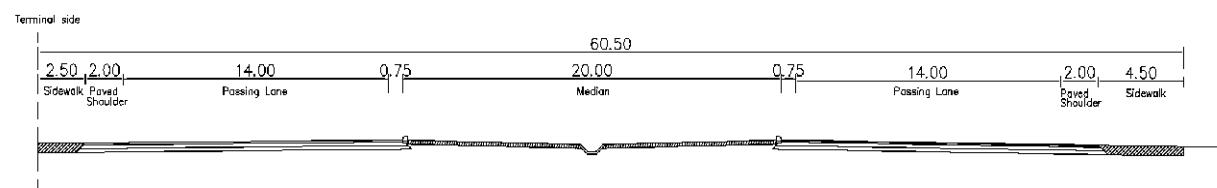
Typical Cross Section of Passing Lane (Future)
